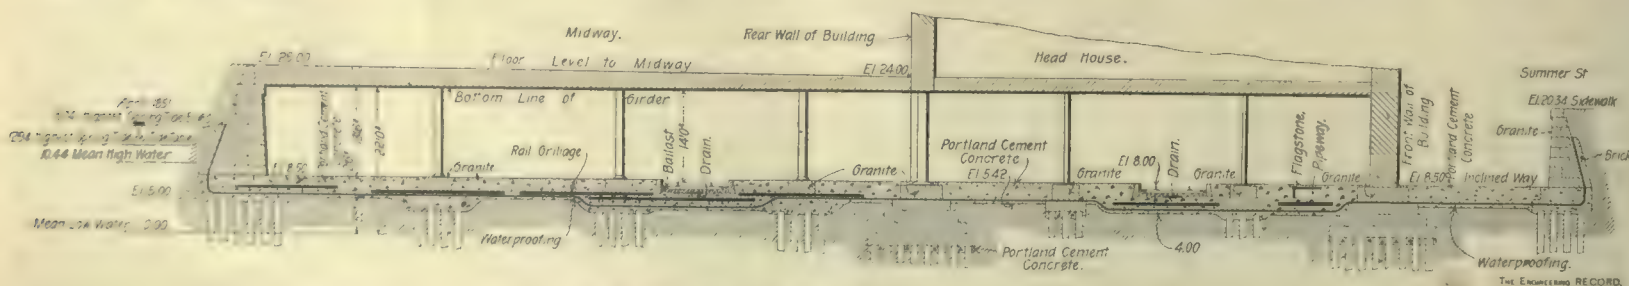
CROSS SECTION THROUGH THE HEADHOUSE.
